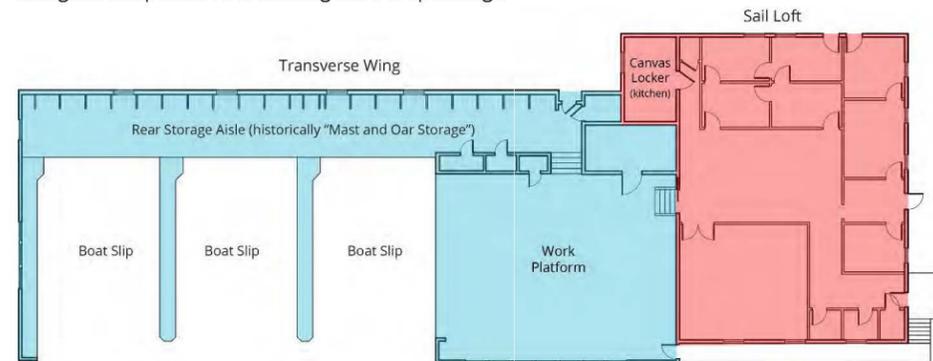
Floor plan of Boathouse, with transverse wing shaded blue and the sail loft including the canvas locker (now the kitchen) shaded red. Source: Page & Turnbull, based on original 1945 floorplan and measurements of existing partitions.
